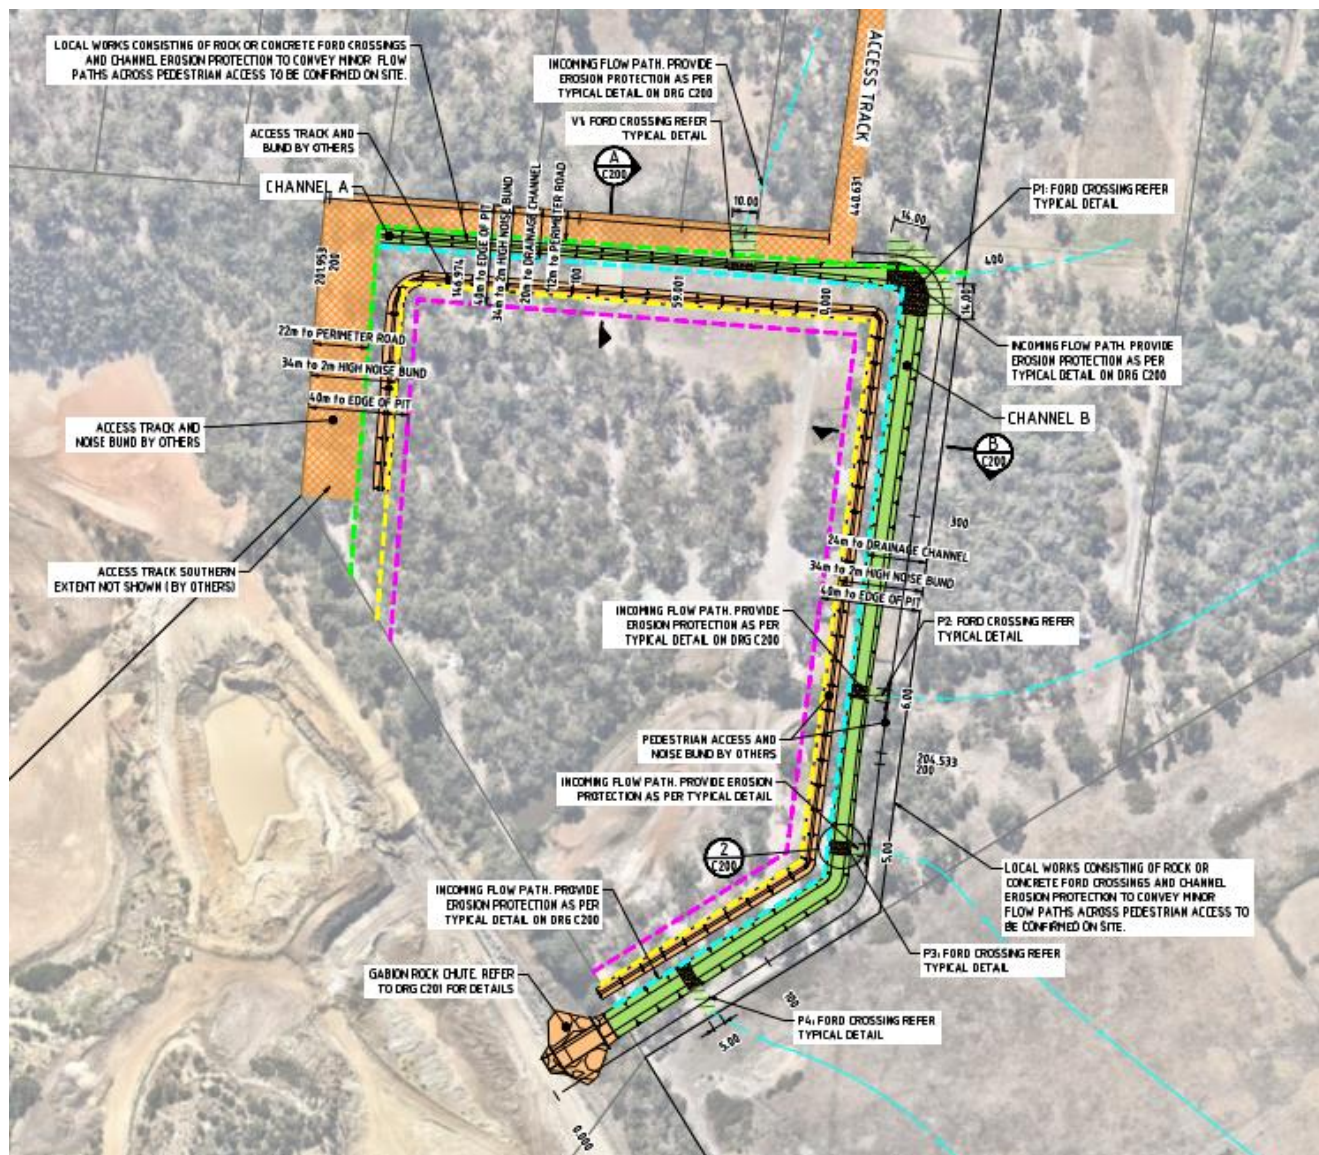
PROPOSED SURFACE WATER MANAGEMENT SYSTEM LAYOUT
